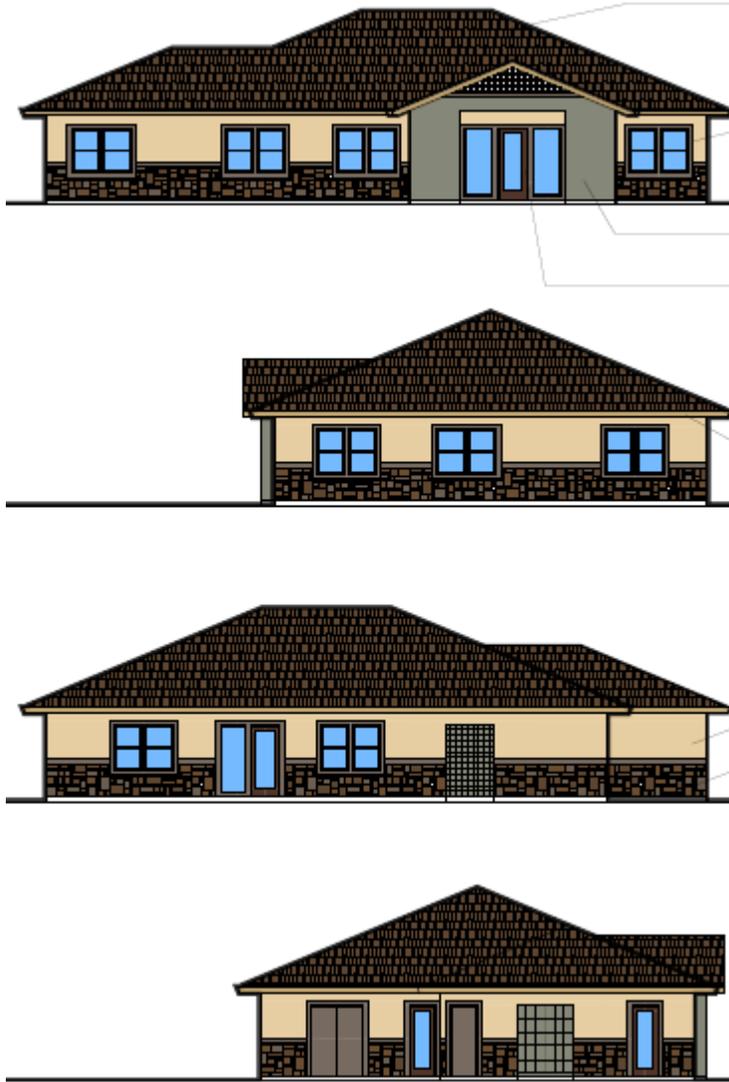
CONCEPTUAL VIEWS OF APARTMENT COMPLEX
